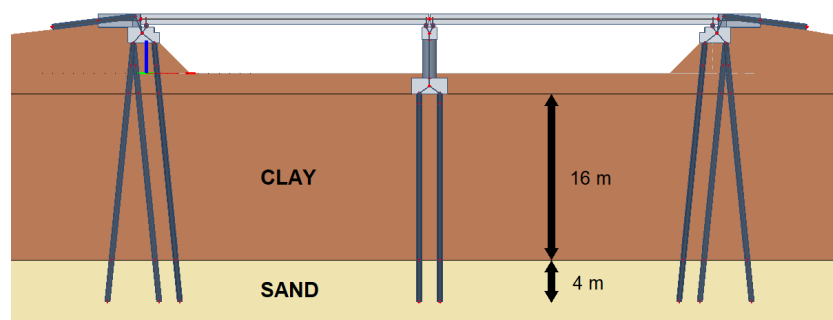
Fictitious soil profile for determination of foundation parameters
